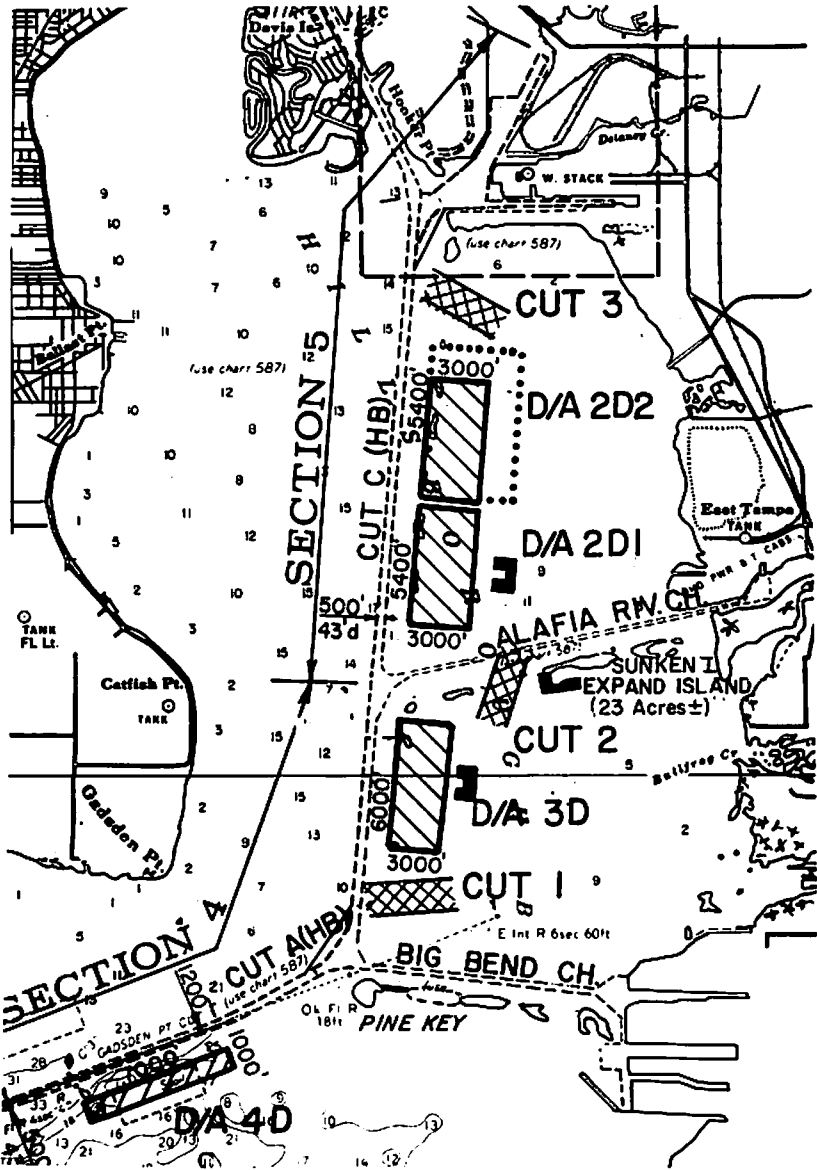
Proposed spoil disposal plan, Hillsborough Bay.
